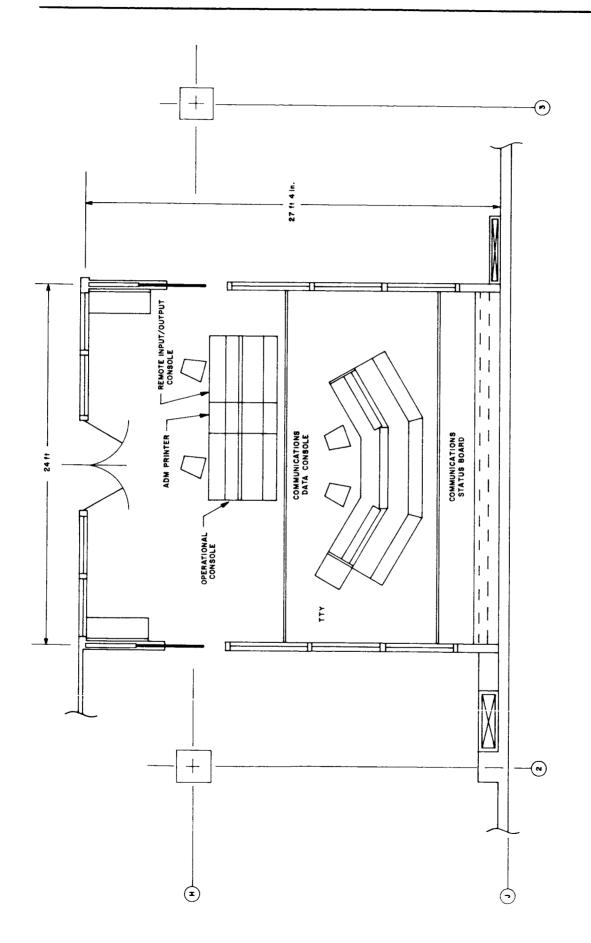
DATA PROCESSING AREA FLOOR PLAN
